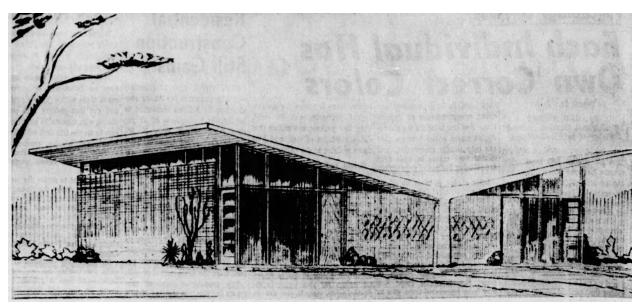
, Sentinel Land and Development Corp. Model House, Architect J.H. Beck drawing, 1958.
